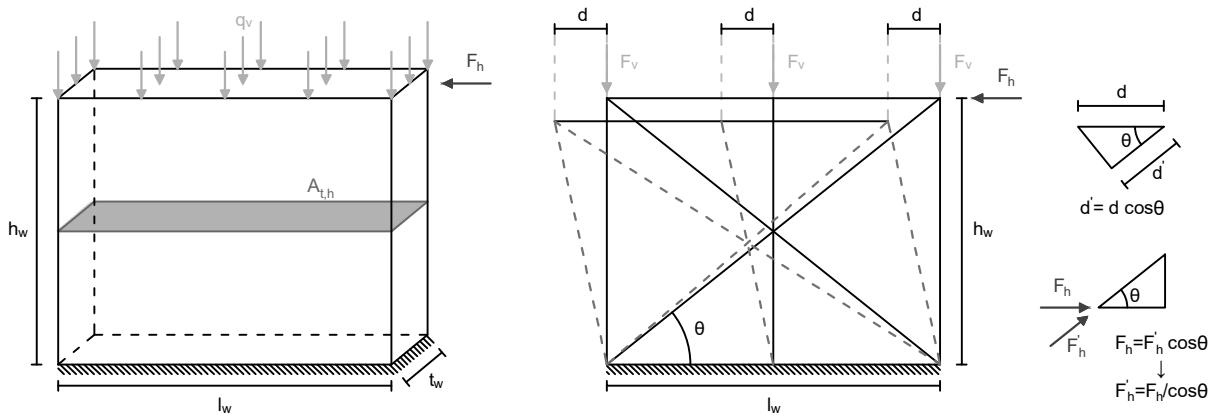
Truss-equivalent system proposed for masonry wall modelling.
